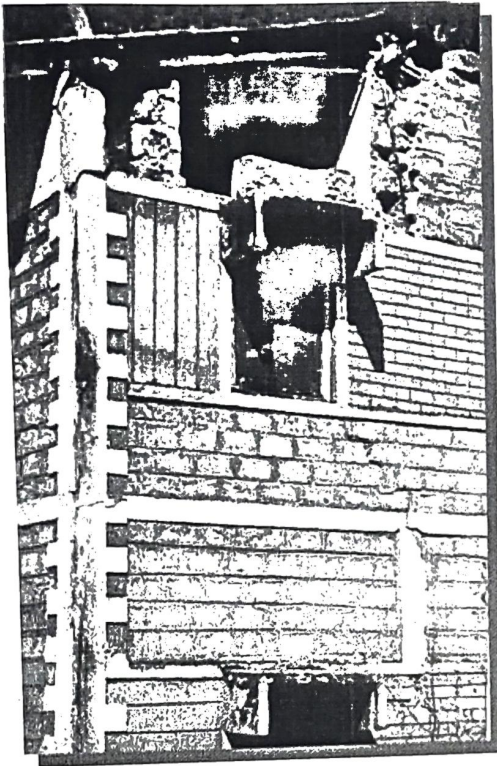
Damage to Gable Wall -Maneri Hydel Project Colony
